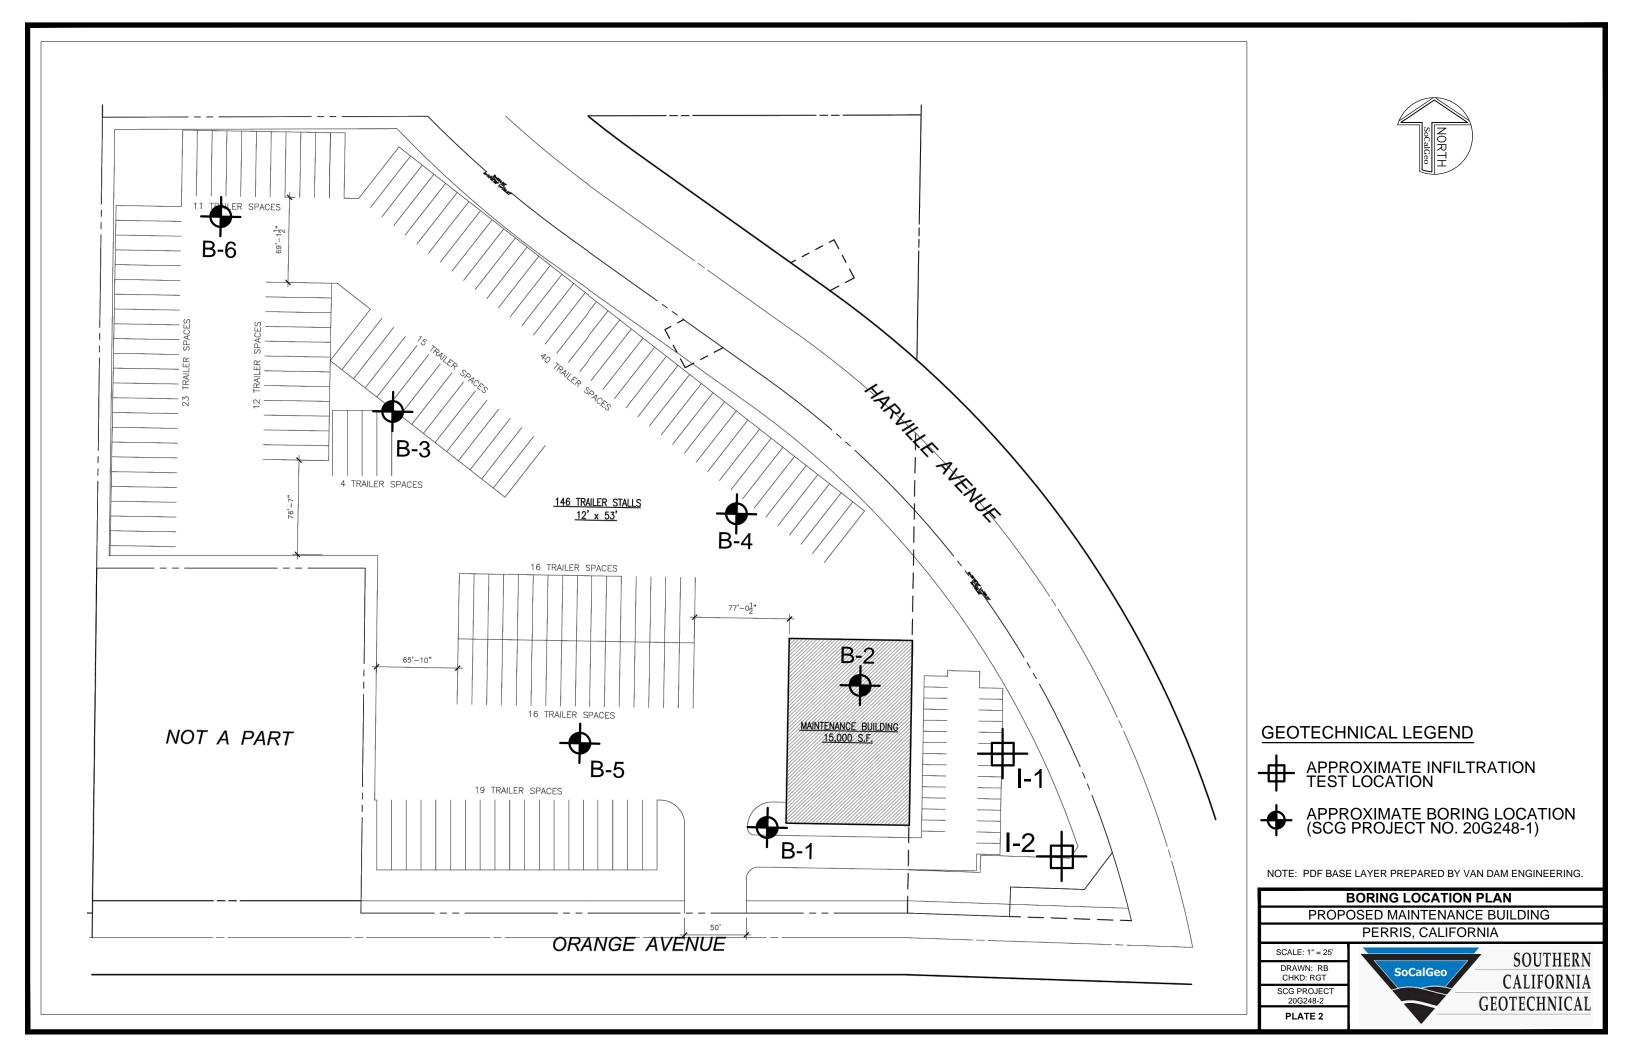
Infiltration Test Location Plan Trench Log Legend and Logs (4 pages)
